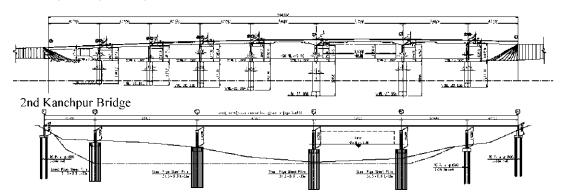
Comparisons of Bridge Shape of Existing and 2<sup>nd</sup> Kanchpur Bridge
